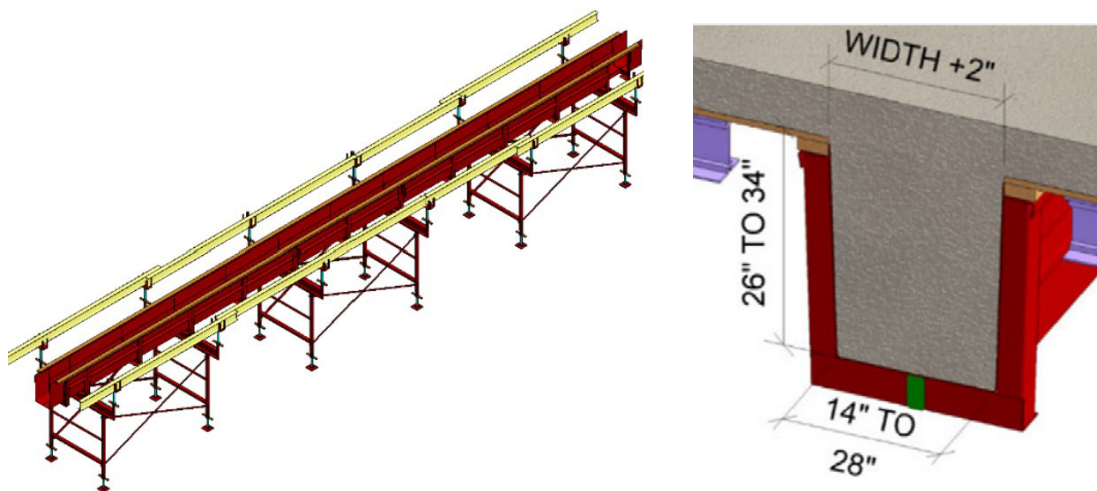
Single-piece forms are commonly used to construct repetitive long-span beams in parking structures. The form sides of such systems can resist fresh concrete pressures without the need for tie rods. (Image courtesy of Ceco Concrete Construction.)
